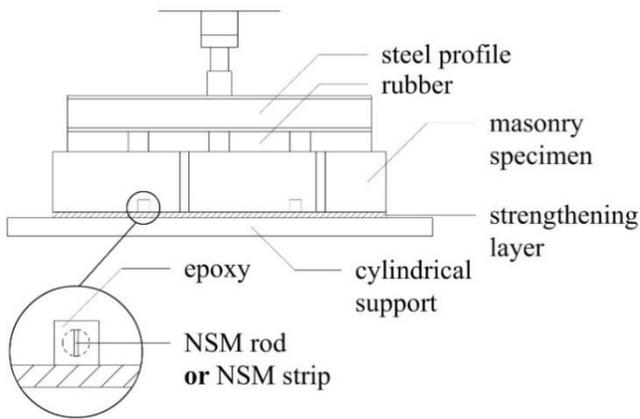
Schematic vertical section over the masonry specimen in the test set up with the position of the strengthening layers and reinforcement indicated.
